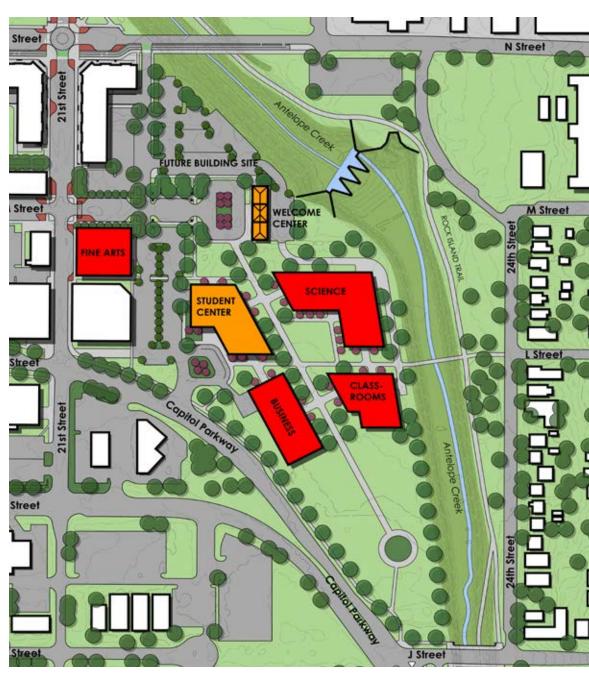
B. DETAIL: Lincoln Telegraph District Campus Master Plan Landscape & Open Space
